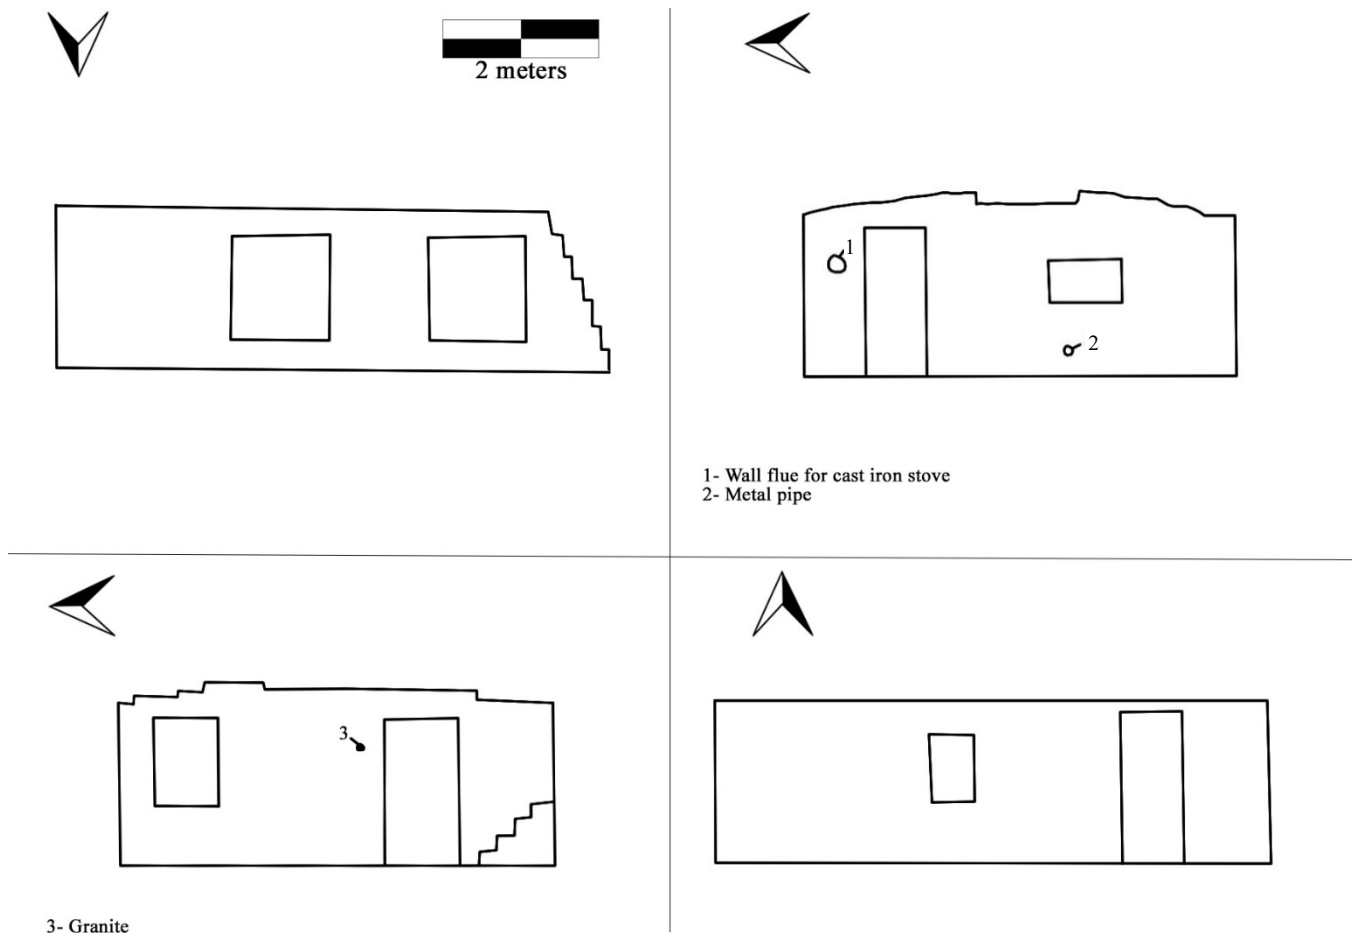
Hand-Drawn Building Elevations for the Primary House Structure.
